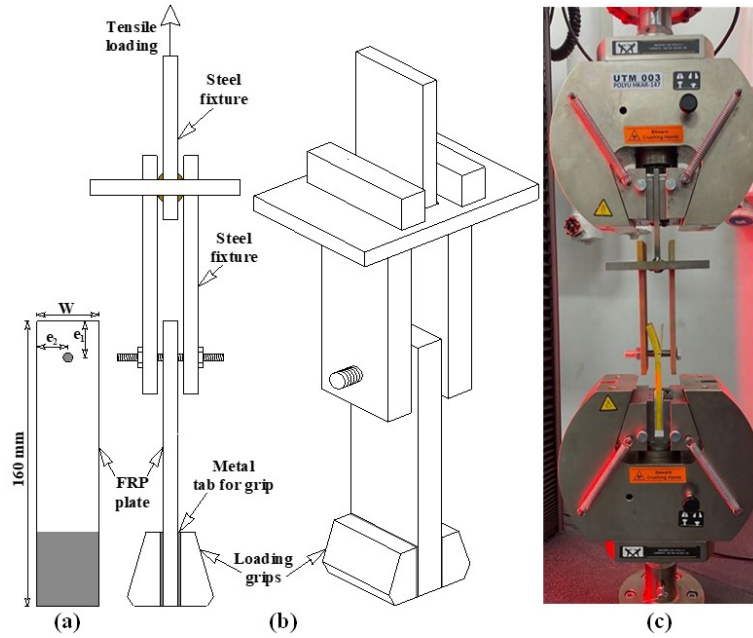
(a) Dimensions of the test sample; (b-c) Test setup for single bolt connection test
